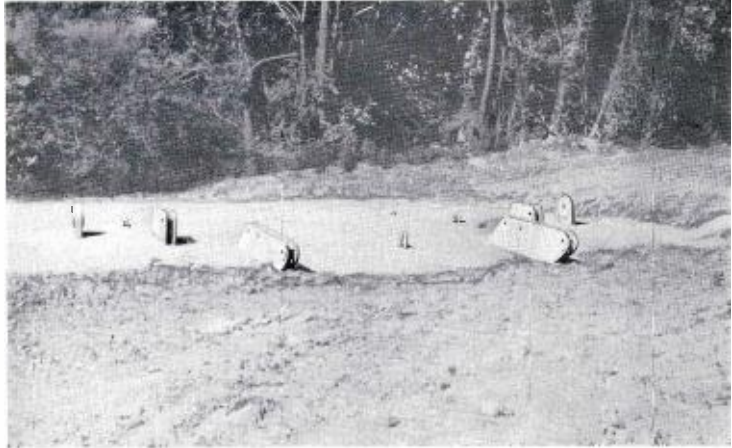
Three guy-anchor points, each identical to the one shown here, are used to support this tower. Extra anchor points were installed for future elevation of the structure. The anchors are 16 feet deep and 33 feet on a side, made of reinforced concrete.
